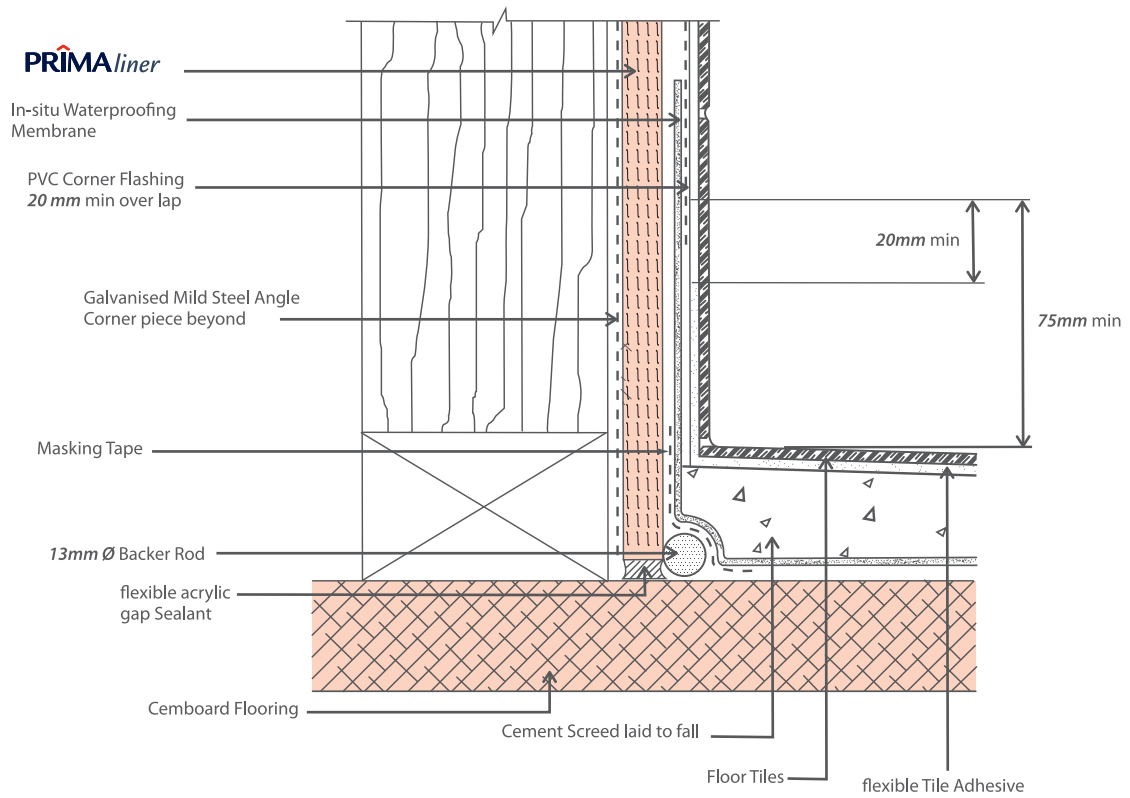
Typical Floor/wall Cross-section for Cast In-situ Internal Membrane
